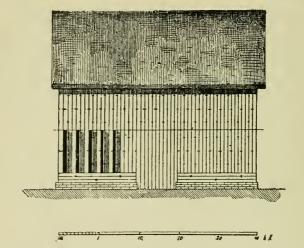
SIDE ELEVATION, GERMAN BARN.
